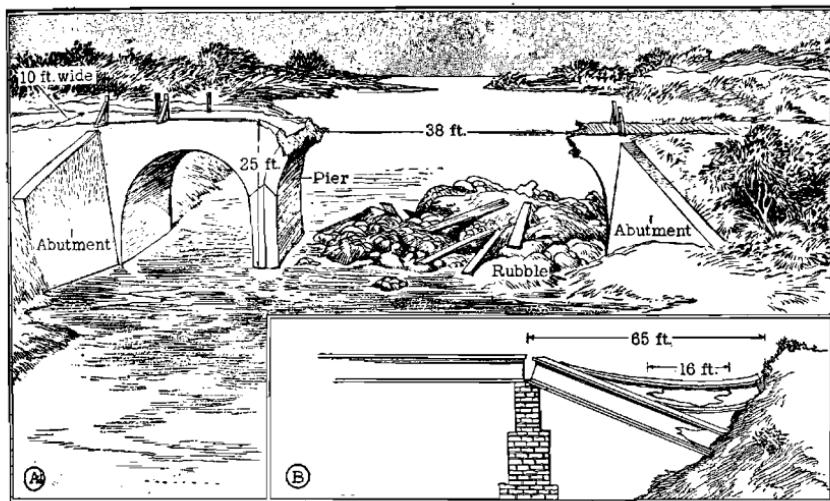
Bridge A. The 40-ft masonry arch was destroyed, but the short span, the center pier, and the two bridge-end abutments were left intact. Figure 1b. Bridge B. The far I-beam (65 ft.) was damaged by a charge which blew out approximately 16 ft. of its vertical section. This beam buckled, but remained in place. One end of the near beam was forced from the abutment and slid down the hillside; its pier end remained in place.
